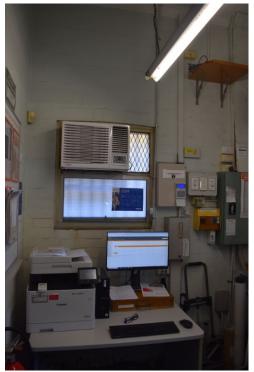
Close up of air conditioning unit inserted within an aluminium framed window on the south elevation.
